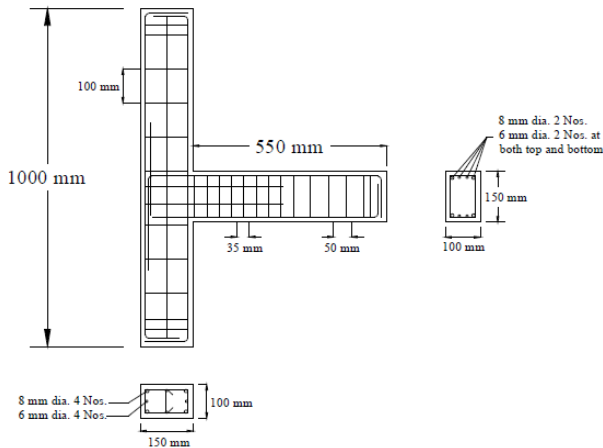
Reinforcement Detailing of Model (K.R Bindhu et. al)
